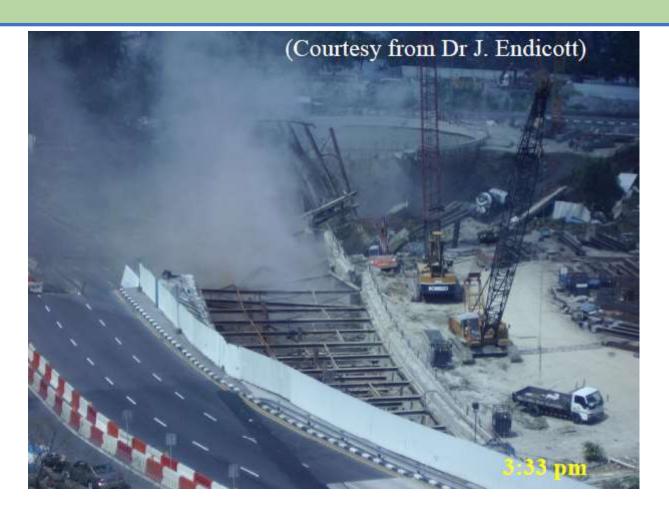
Structural failures of retaining walls (Atkinson, 1993)
